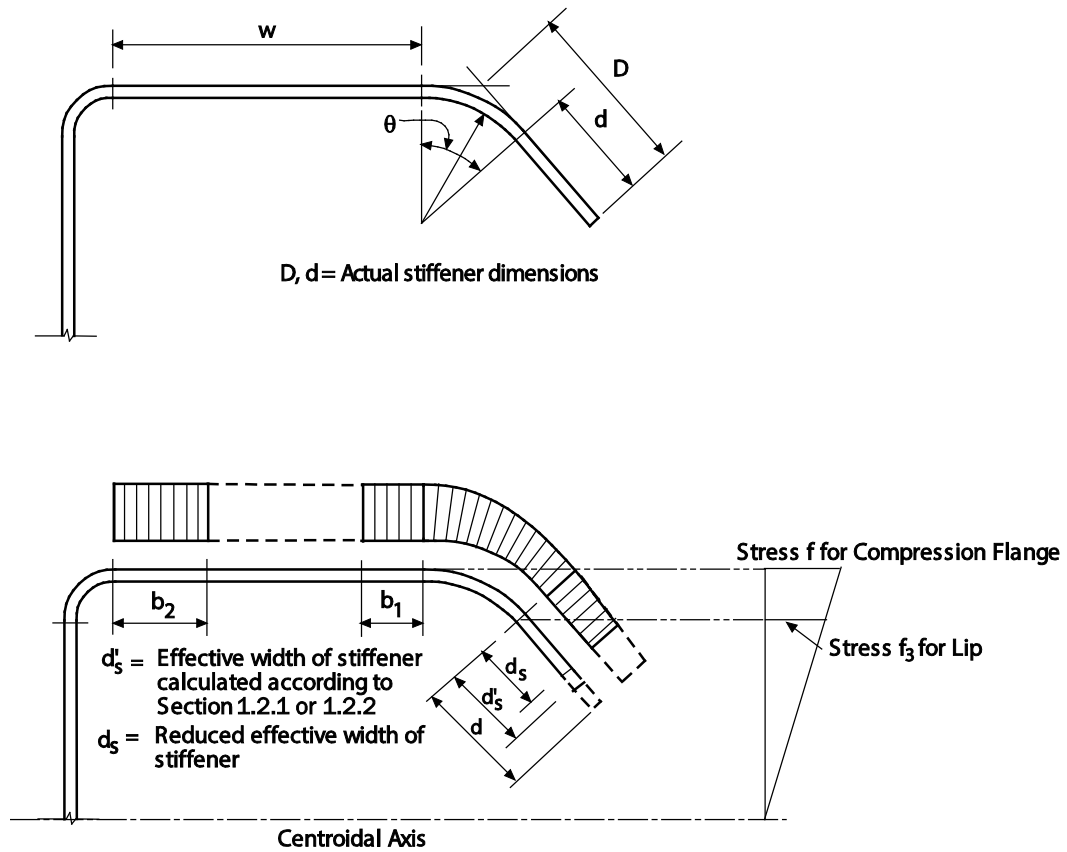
Element With Simple Lip Edge Stiffener
